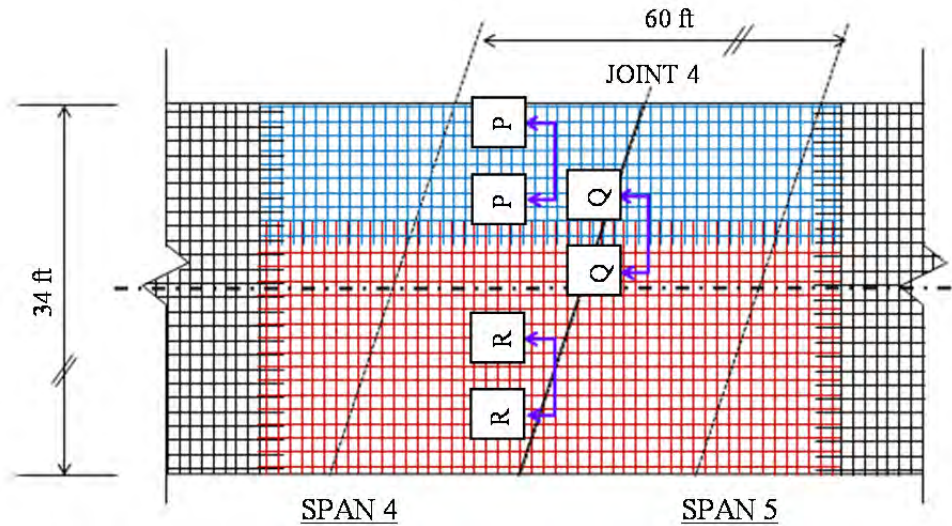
Details of transverse splices, Lampasas River Bridge (Span 4 and Span 5)
